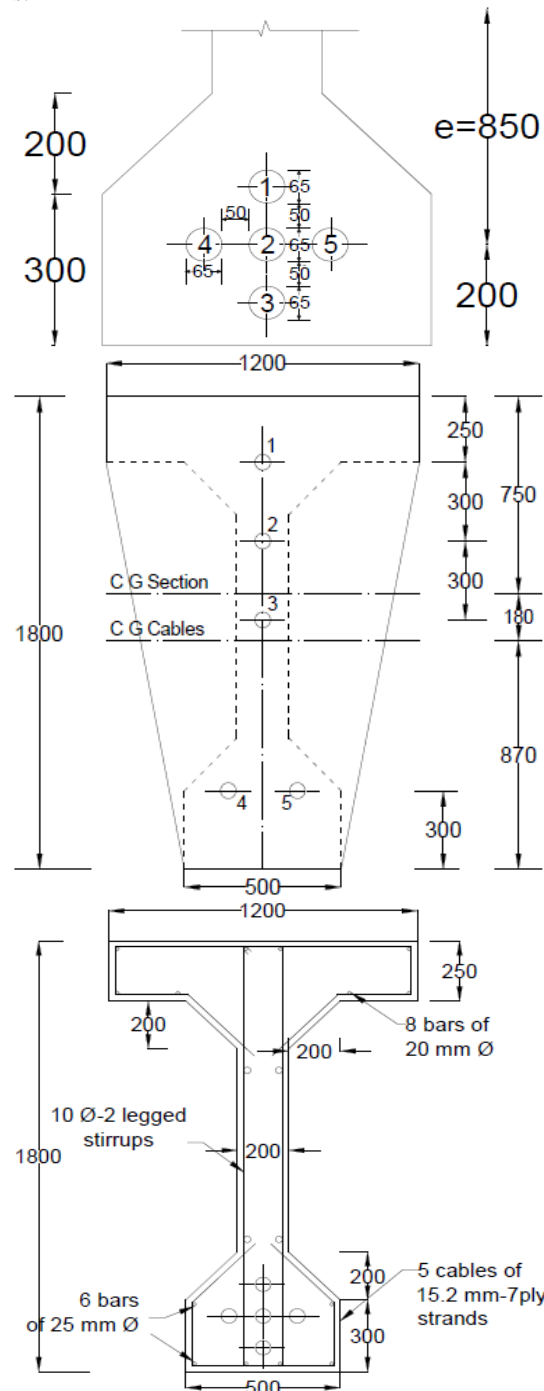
Arrangement of cables at centre of span and support section and reinforcement at centre of span (for effective span 30m)
